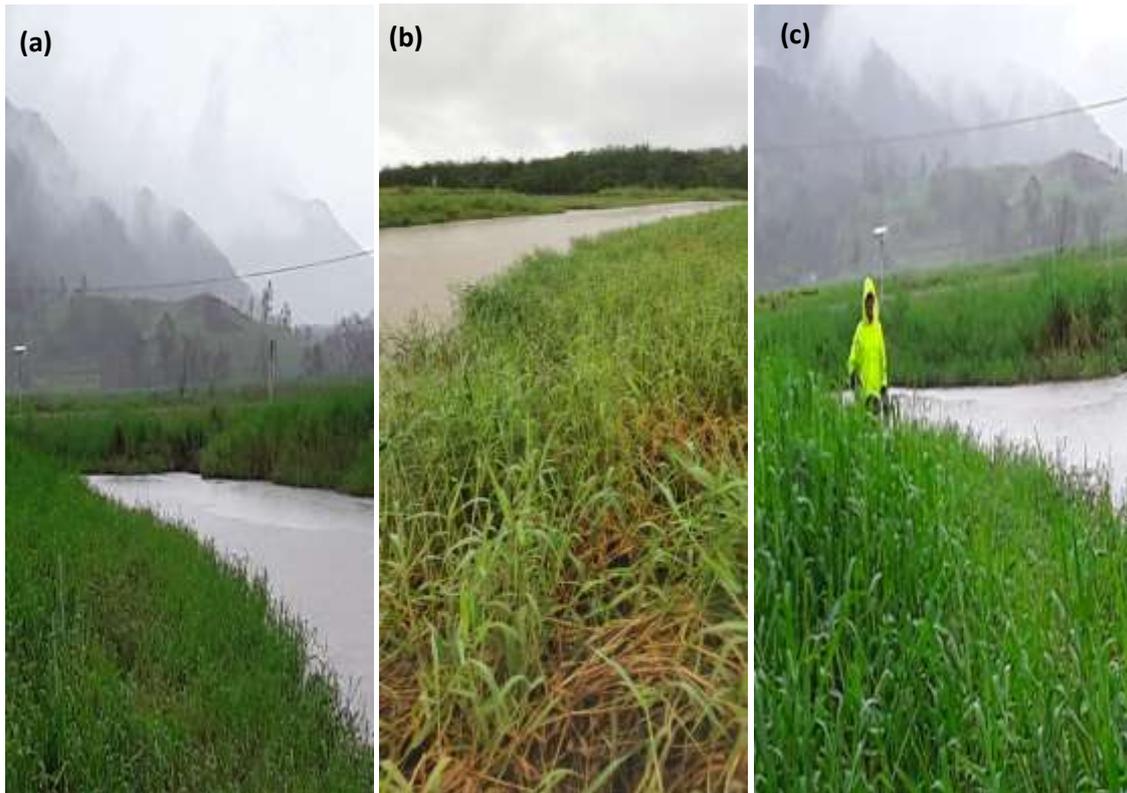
Photographs trash rack site with (a) & (c) showing actual location of proposed trash rack and (b) showing the access area to the trash rack site.
